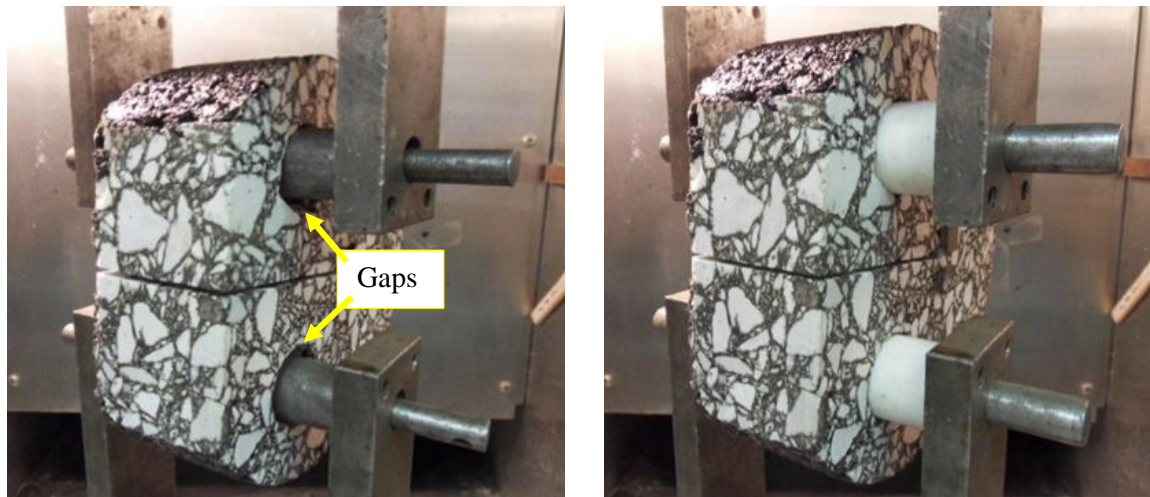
Standard loading bars (left), and modified loading bars (right).
